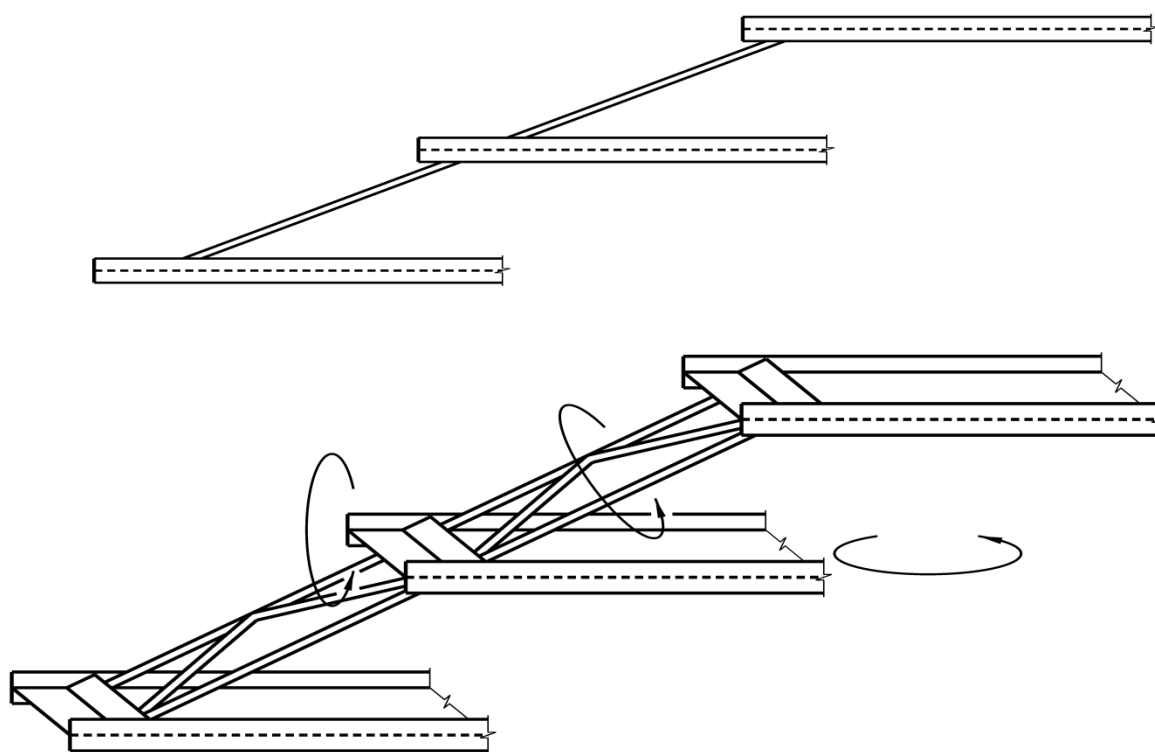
Rotations of Girders and Cross-Frames & Layover of Girders at Skewed Cross-Frame Lines
